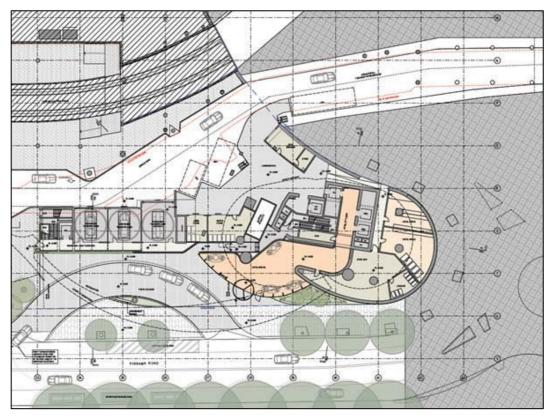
Level B2 Floor Plan (FJMT Studio, Sheet No. AF204)
